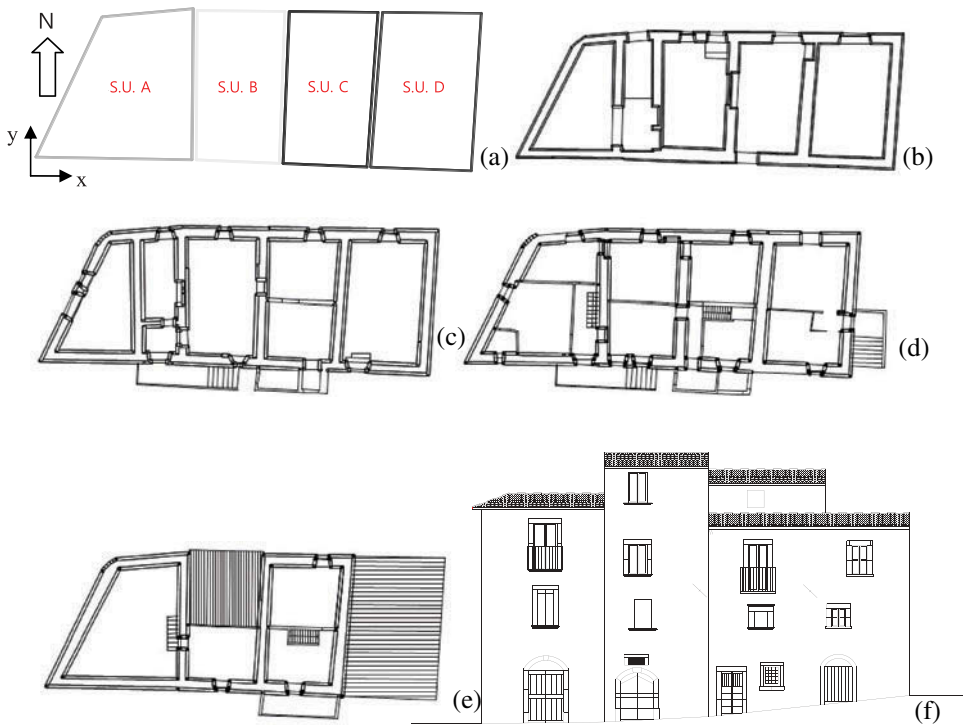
The aggregate type B: general plan layout (a), underground floor (b), ground floor (c), first floor (d), second floor (e), and north side view (f).
